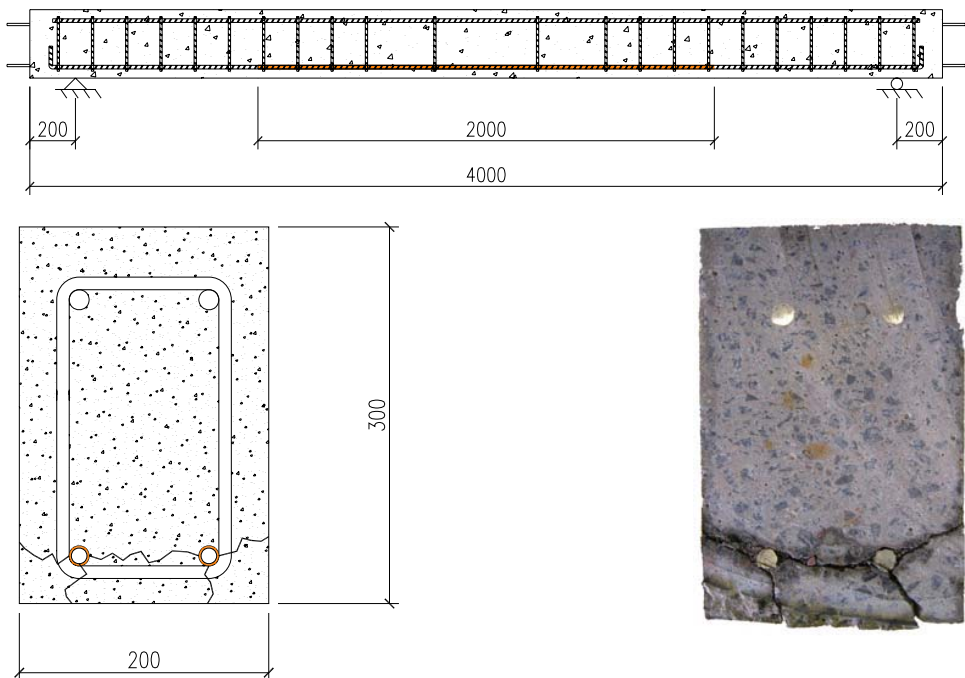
Top: Beam specimen measurements and steel reinforcement layout. Bottom left: Cross sectional view of corroded beam. Bottom right: Cross section of real corroded beam.
